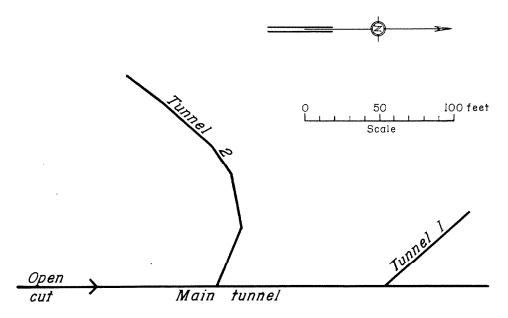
Plan of tunnel 7, Kauai County Moalepe tunnel.
